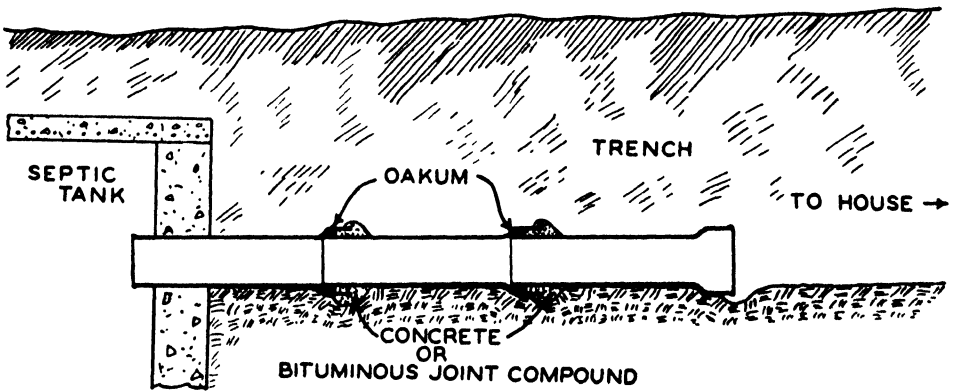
Method of laying vitrified bell-sewer tile using oakum and cement mortar to seal the joints.
